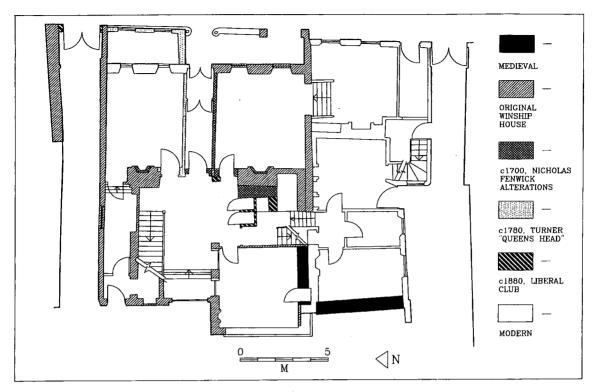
Alderman Fenwick's House: Ground Floor Plan.
